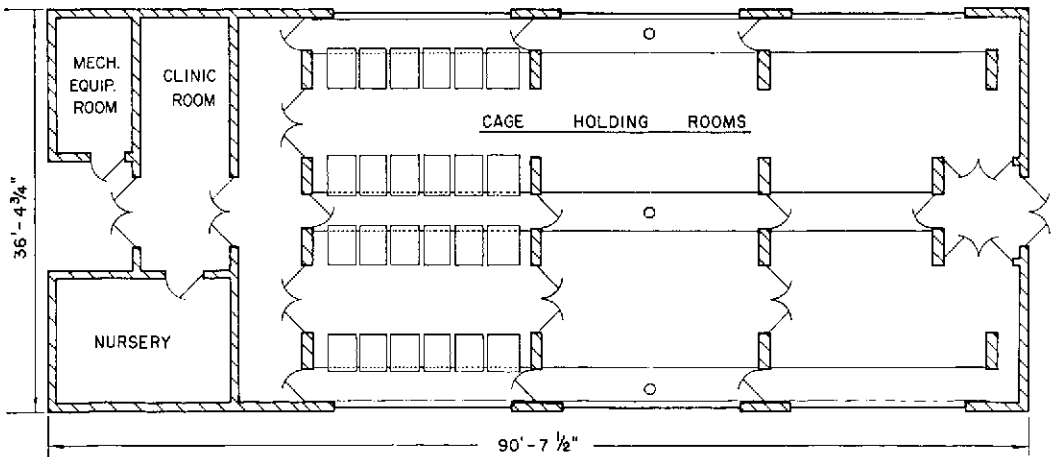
Animal room in quarantine building, Southwest Foundation for Research and Education.
